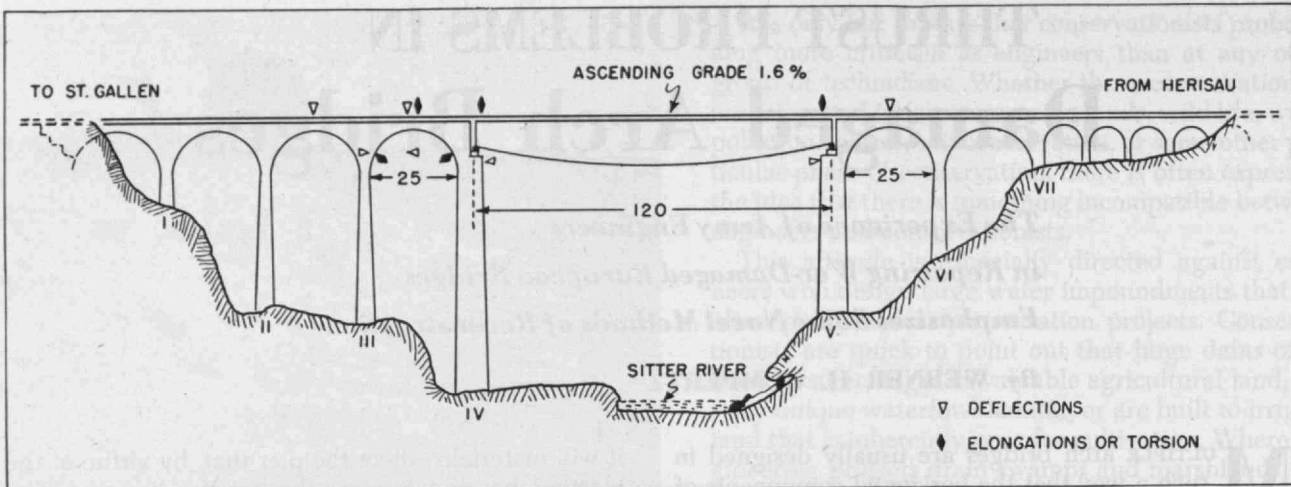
Diagram of arched bridge between St. Gallen and Herisau, Switzerland, before damage of central arches. The great height of Pier IV, more than 300 feet, made repair a difficult task. All dimensions are in meters. Positions of tensiometers are indicated in the diagram.
